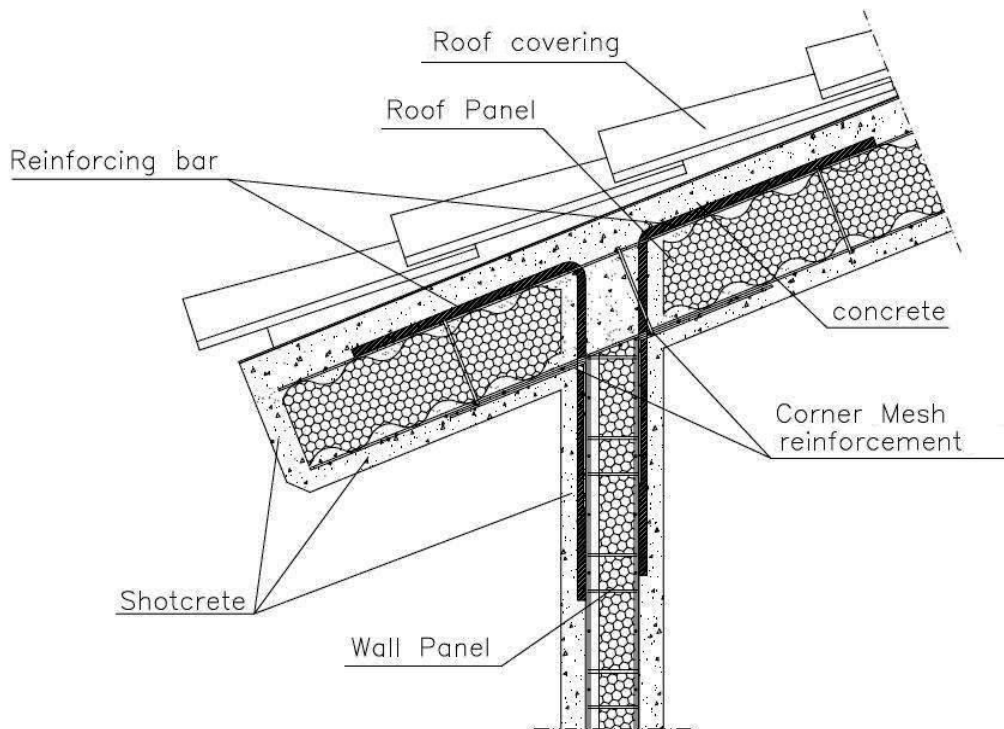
TYPICAL INSTALLATION DETAILS (Continued)
